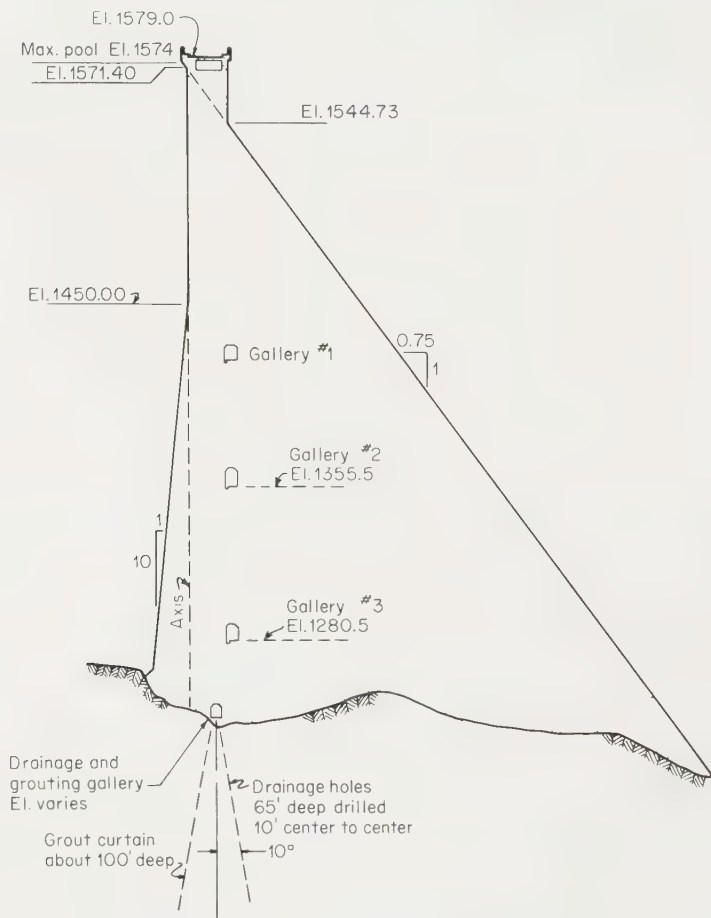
Detroit Dam—typical nonoverflow section; scale: 1 in. = 50 ft.
